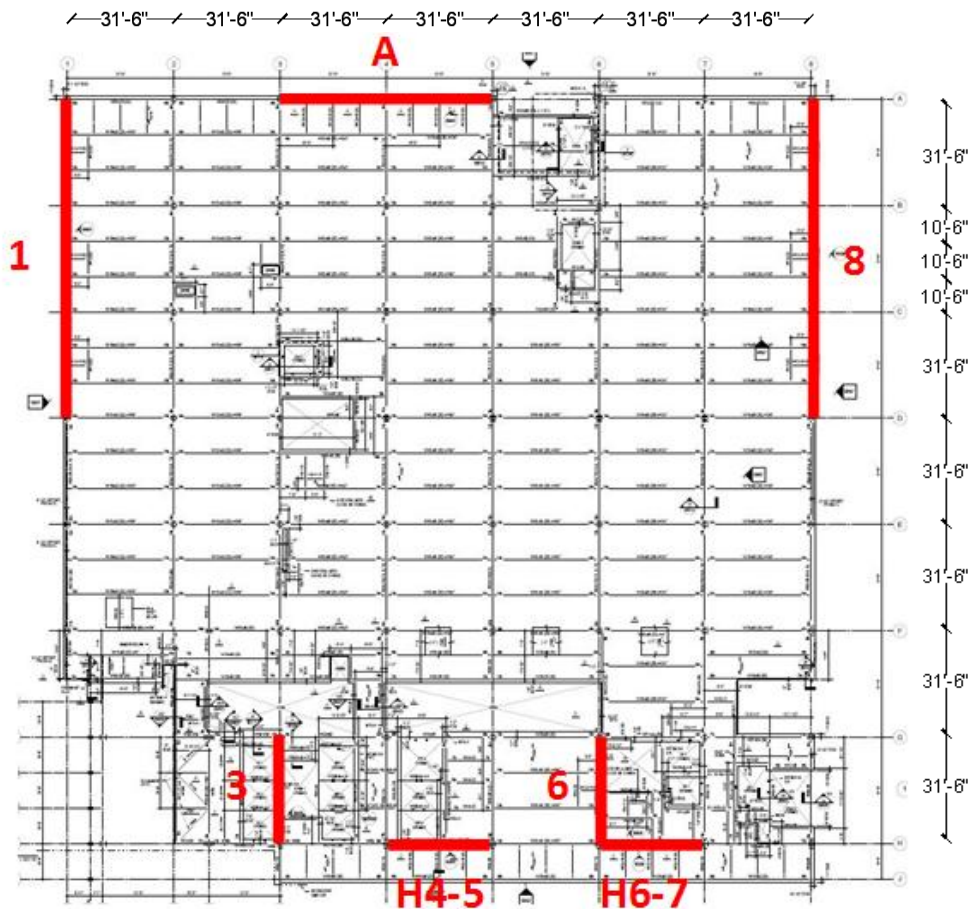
Figure A – Level Two Framing Plan with Braced Frames Highlighted (Cannon Design)
